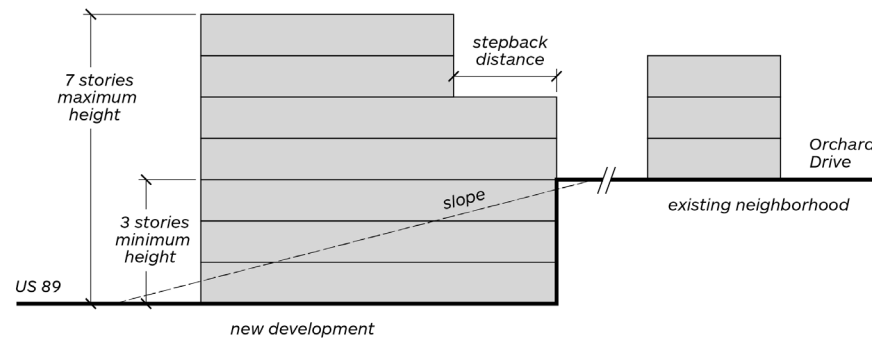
Building section height and stepback on sloped site diagram. Not to scale
